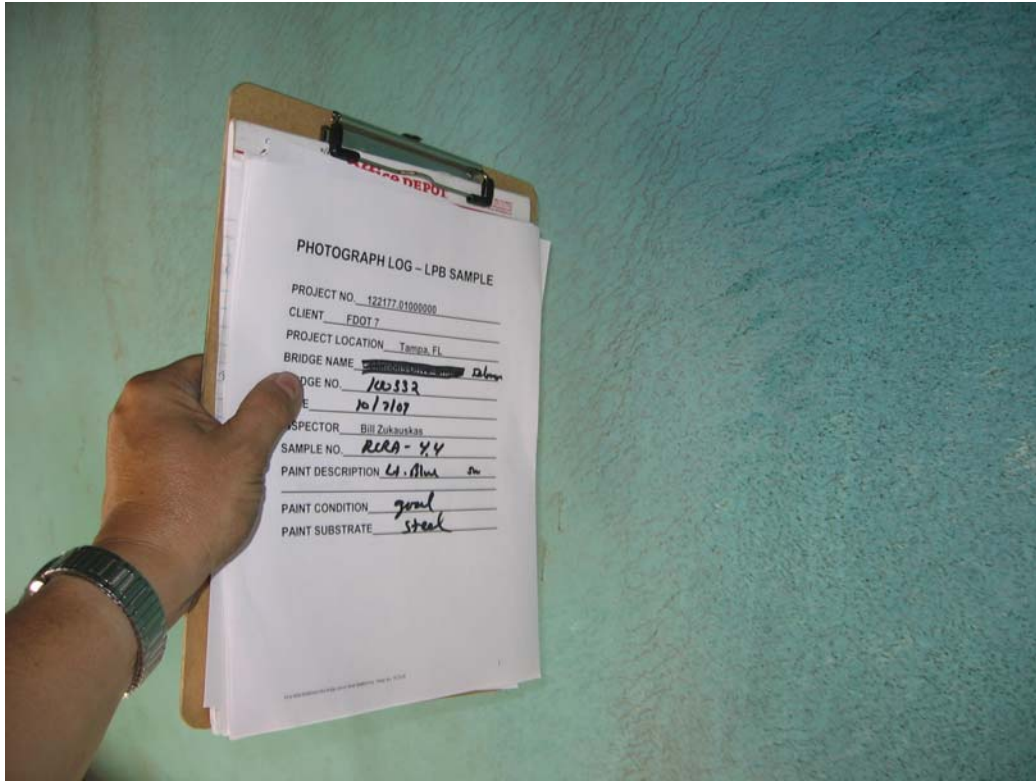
10/02/09 – SAMPLE RCRA-4.4
